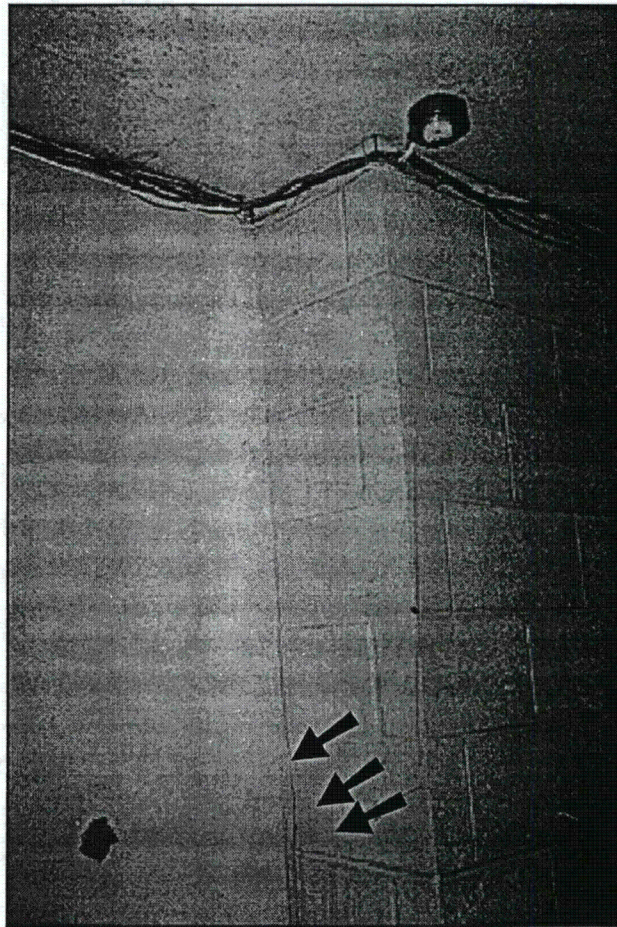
No ceiling tile water damage but evidence of fluid on the wall
